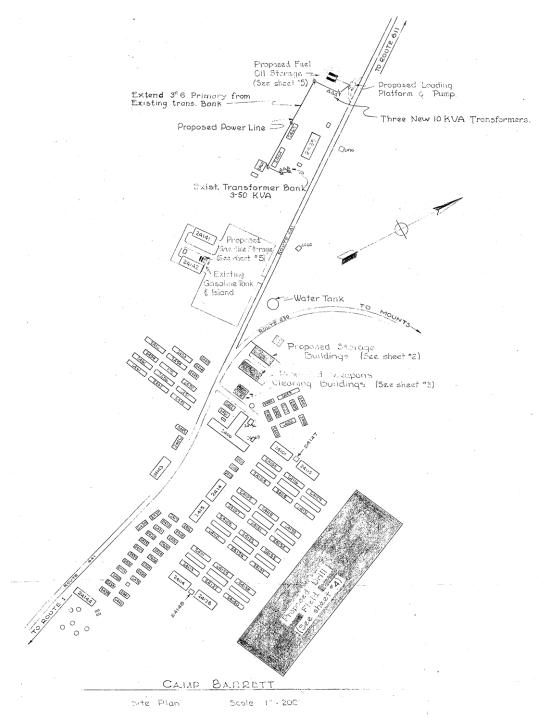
Site plan of Camp Barrett during camp expansion program, Marine Corps Schools, 5 February 1952 (NARA College Park).
